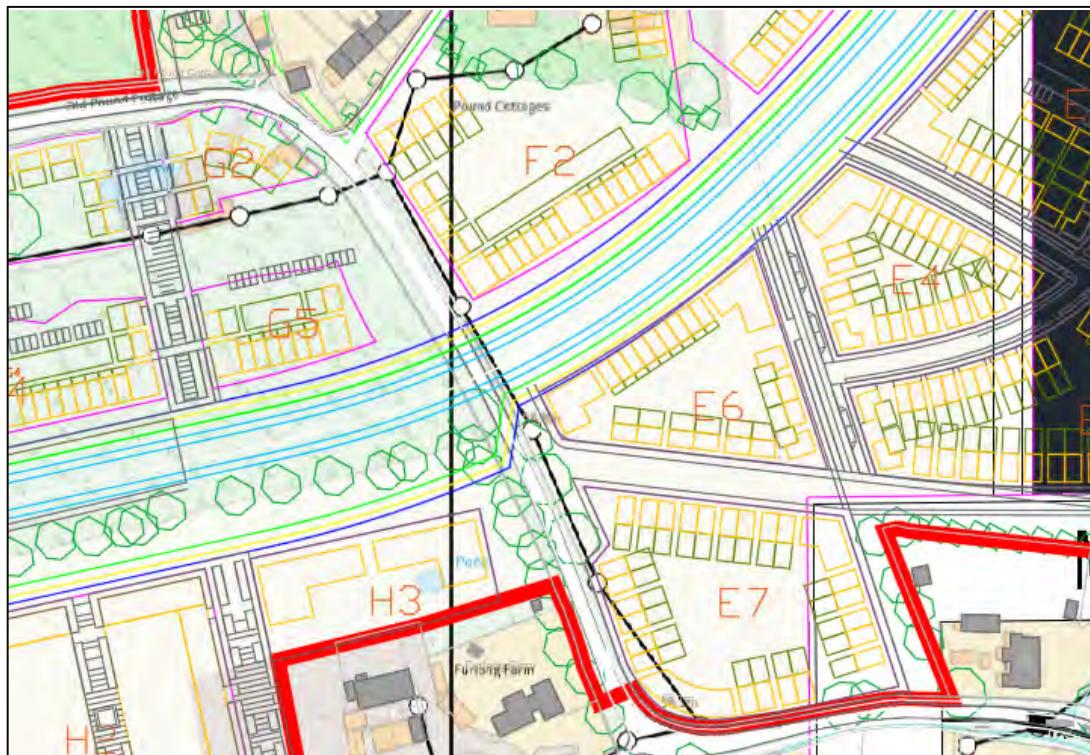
Openreach Assets (VFB03099C) Overlaid with Development Proposals - Rusper Road Junction
